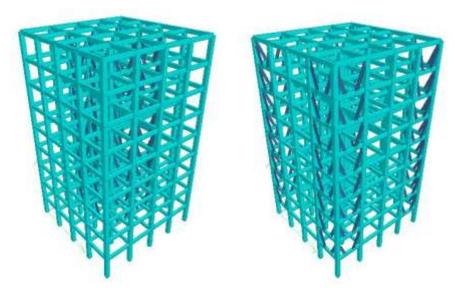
Structural model of K Bracing at Core Figure 4.7: Structural model of K bracing at outer
